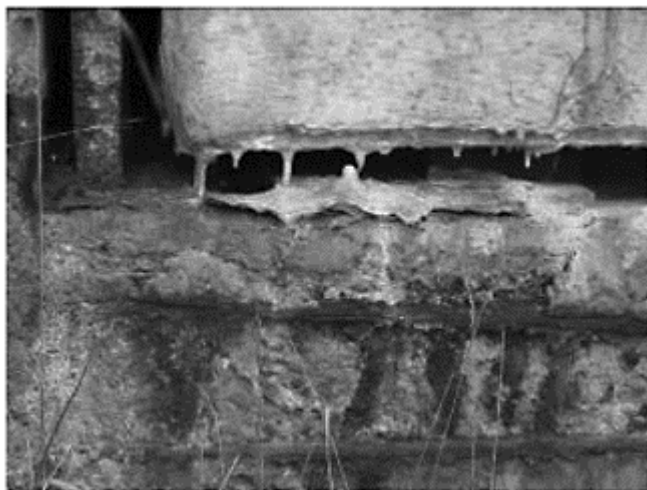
Reinforcement corrosion on abutment wall.
